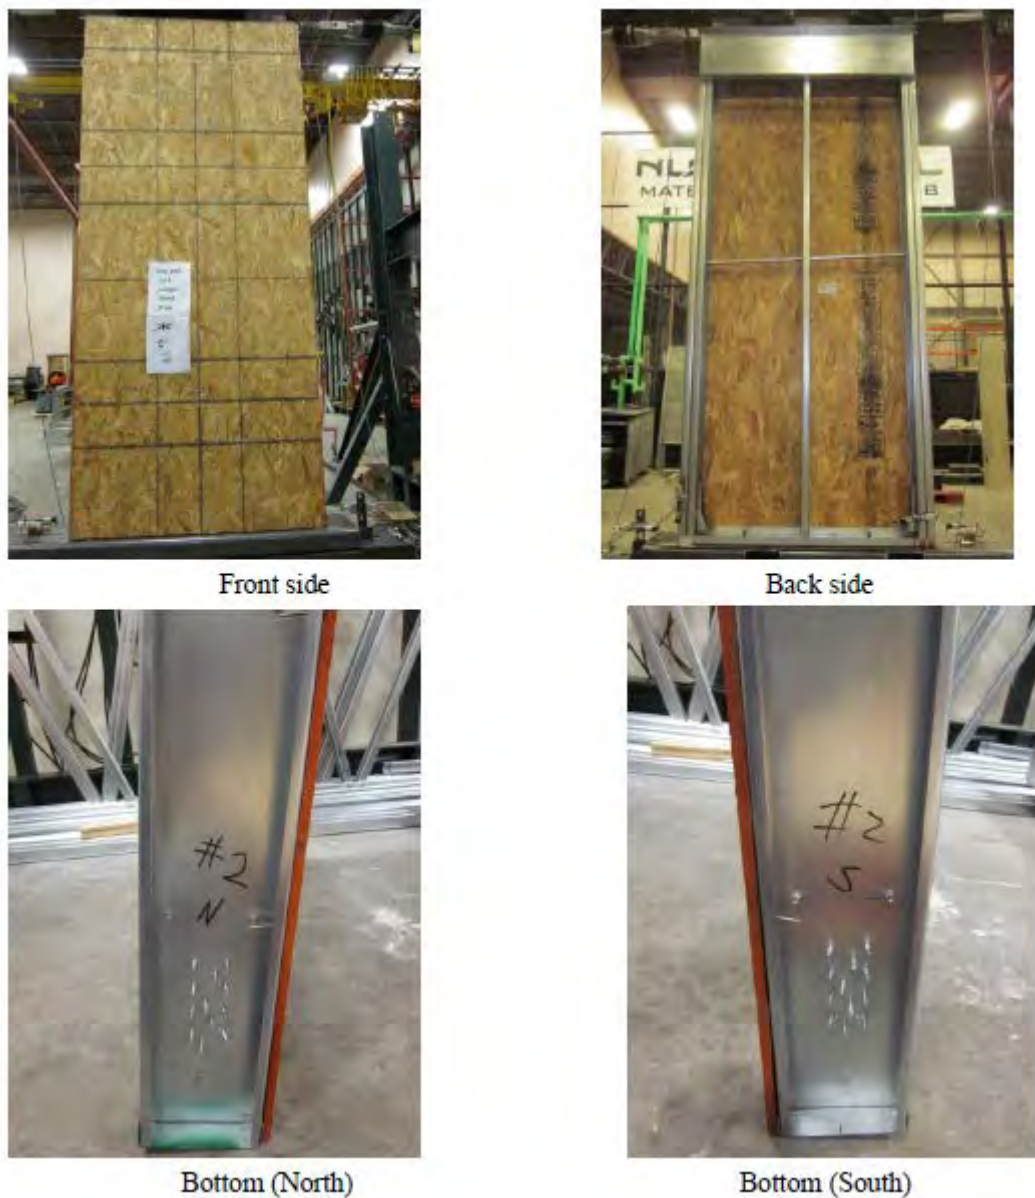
Conventional shear wall with OSB sheathing (specimen No.2, from [8])
